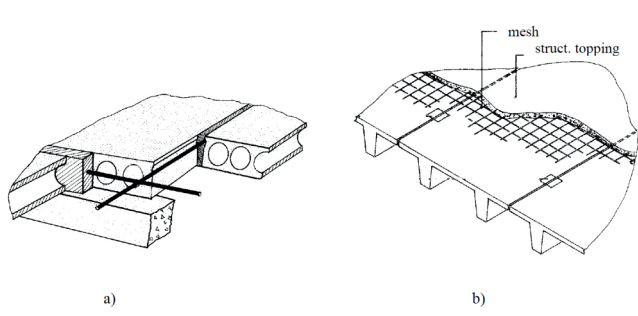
Typical floor systems, a) hollow core floor system, b) Double-T floor system
